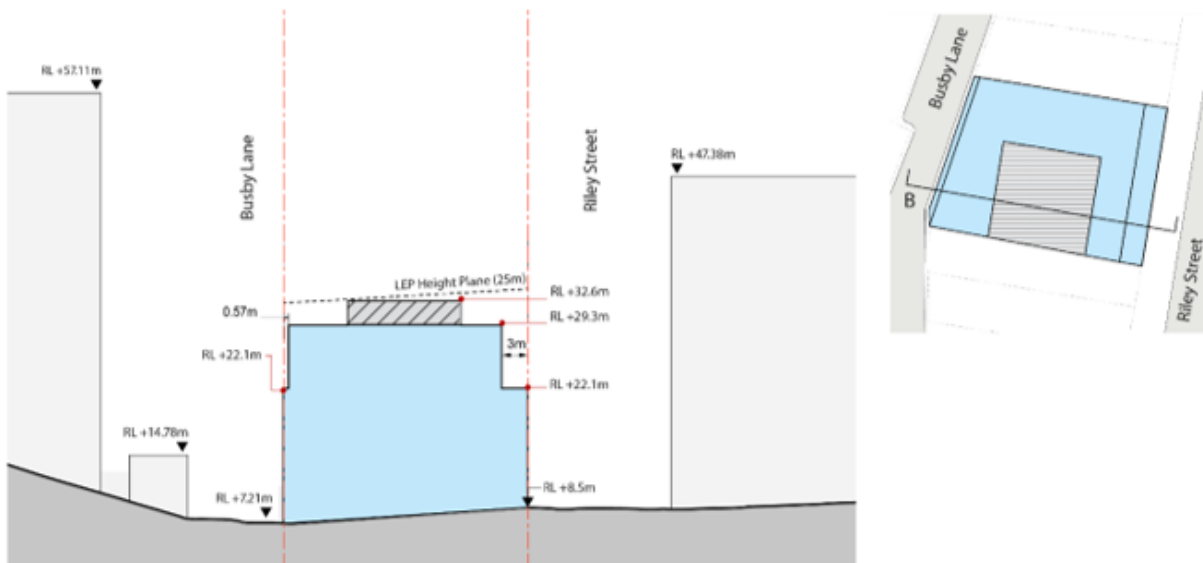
Maximum Building Envelope Section B (hatched area represents an allowance for roof top structures under the LEP Height control)
